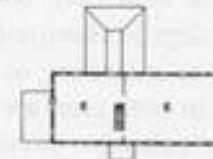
Third-floor plan of the Mansion House after 1878.
